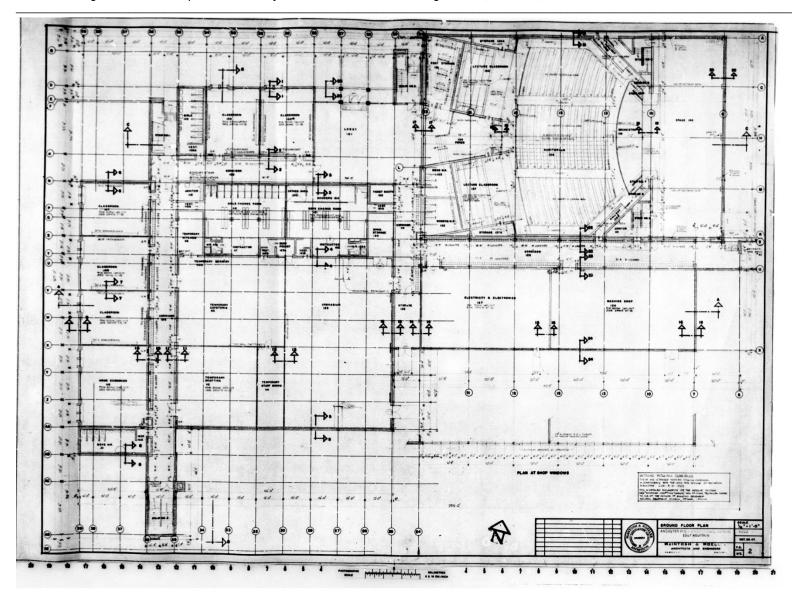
Ancaster High – McIntosh & Moeller, Ground Floor Plan, West Wing Addition (Auditorium) 1967 (Slide 41-113: Provided by Hamilton Wentworth District School Board Archives)
